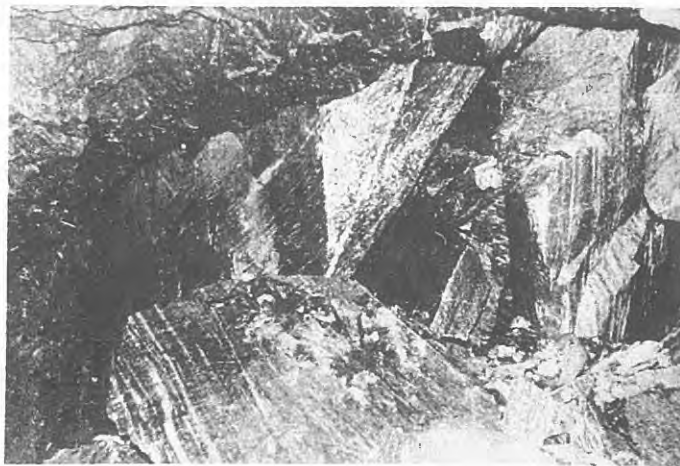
A "wall" of blocks in a water conveying tunnel caused by rock falls from the side of a clay zone with a width of about 0,5 m.
